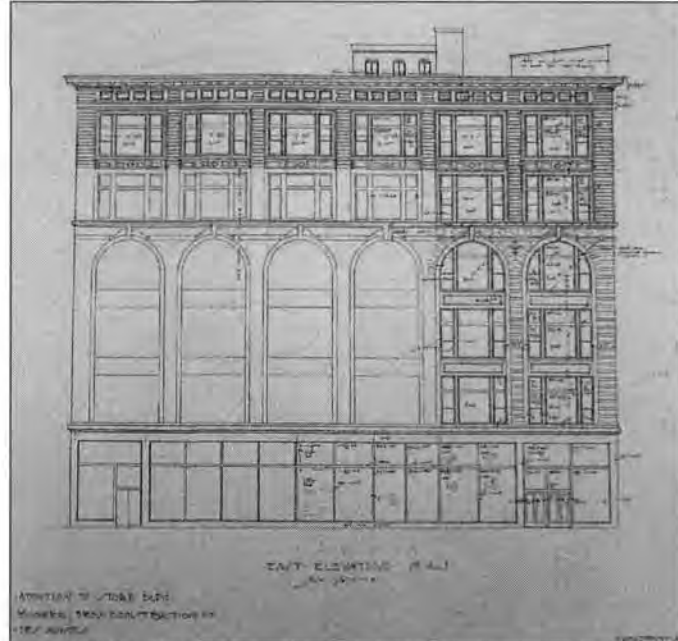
Added sixth floor and north extension, east elevation, east building (original plans, architects Proudfoot and Bird, Sheet 9, undated)
